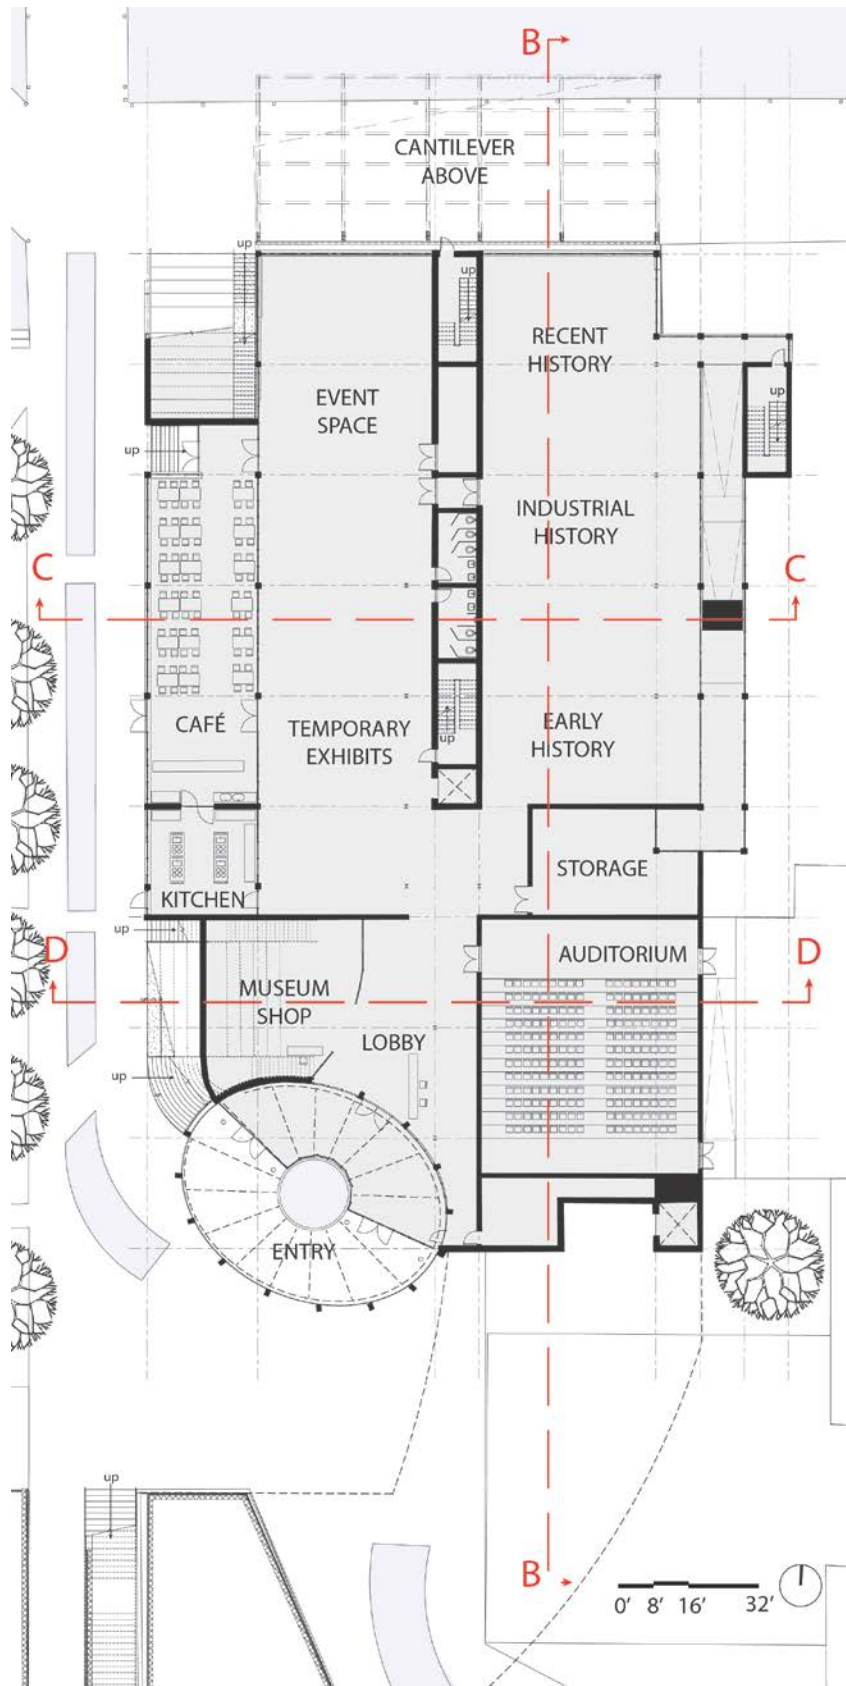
First floor plan, Museum, Final design scheme, image by author.
